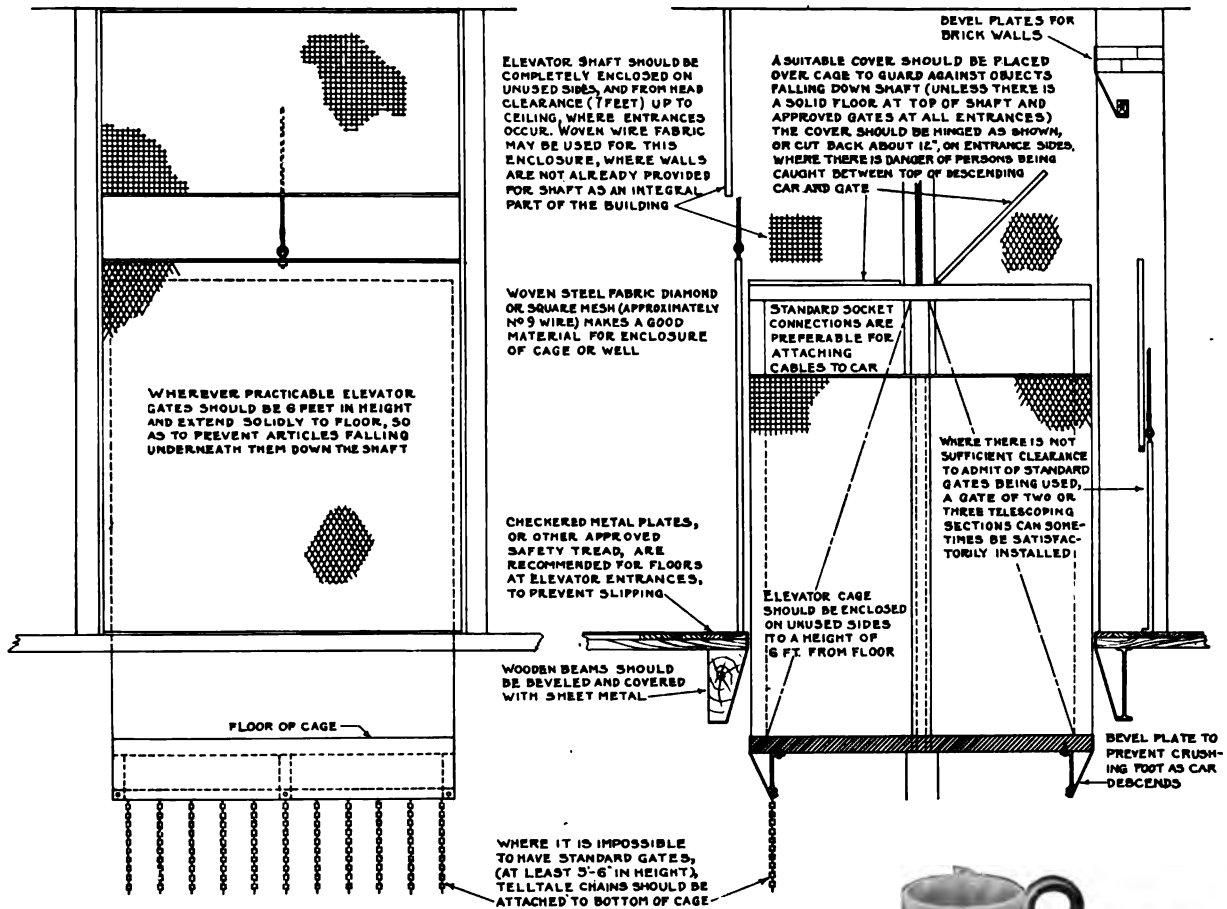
Drawing illustrating Car and Shaft Enclosure, Tell-tale Chains, Bevel Plates, Cover over Car, etc.
